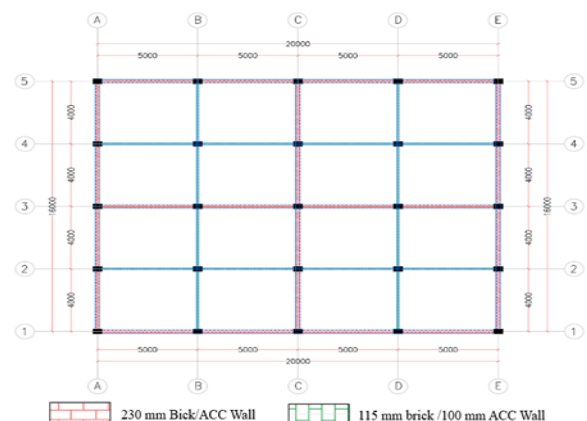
Wall Layout for Typical Floor (Case 1 & 2)
